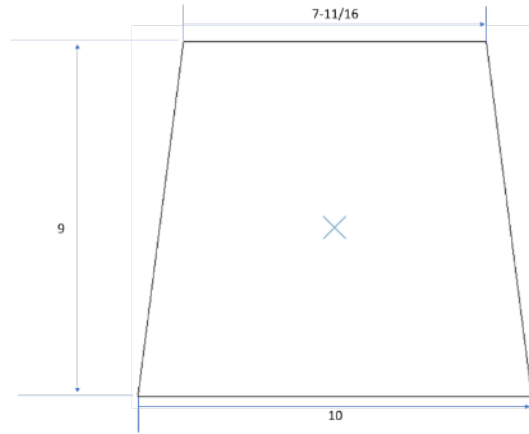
Concrete Tie Cross-section (dimensions in inches)
